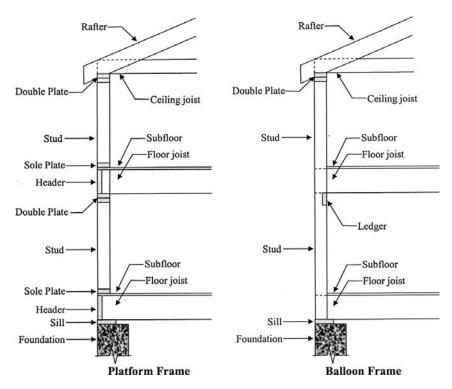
(a) Platform and (b) balloon framing systems.
